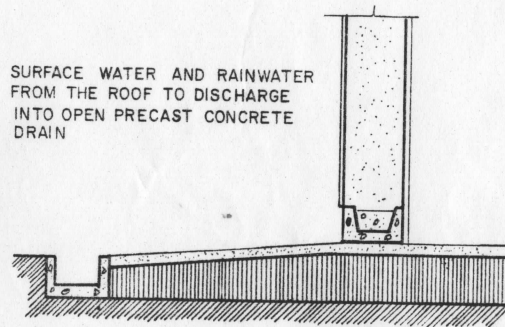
Attakpame wall with precast U-beam base (after ref 11)
